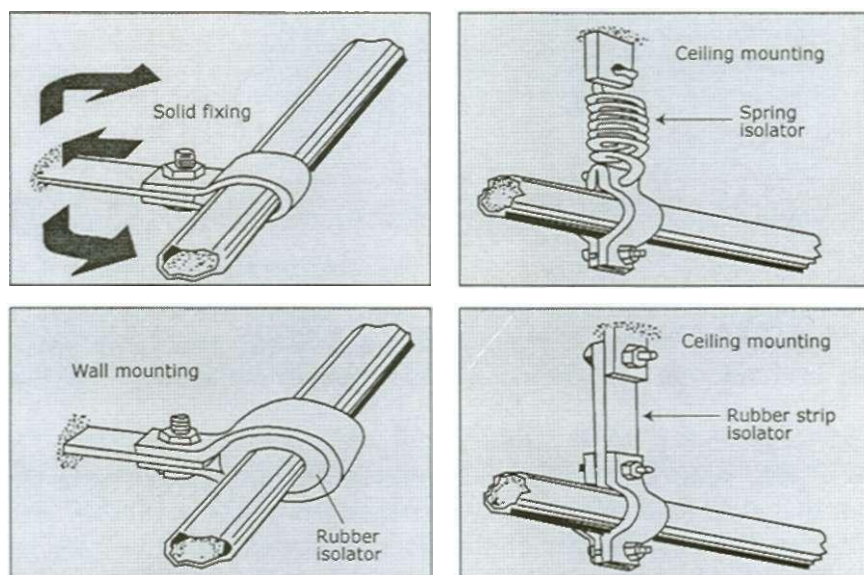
Flexible connectors for preventing vibration transmission to building structure.
